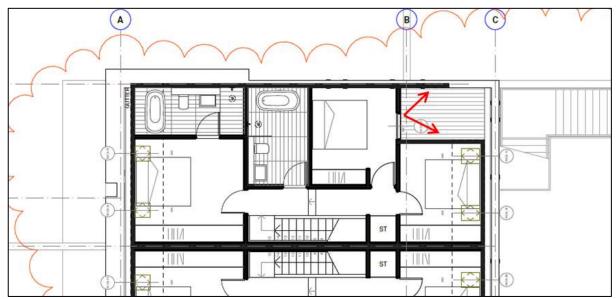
Outlook form bedroom window – dwelling 8. Front, northern-most bedroom to be removed.
